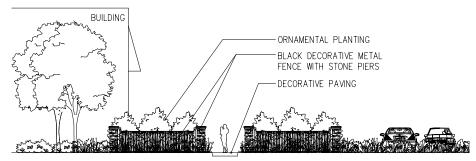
Pedestrian Entrance - Stone Columns with Decorative Fence and planting
